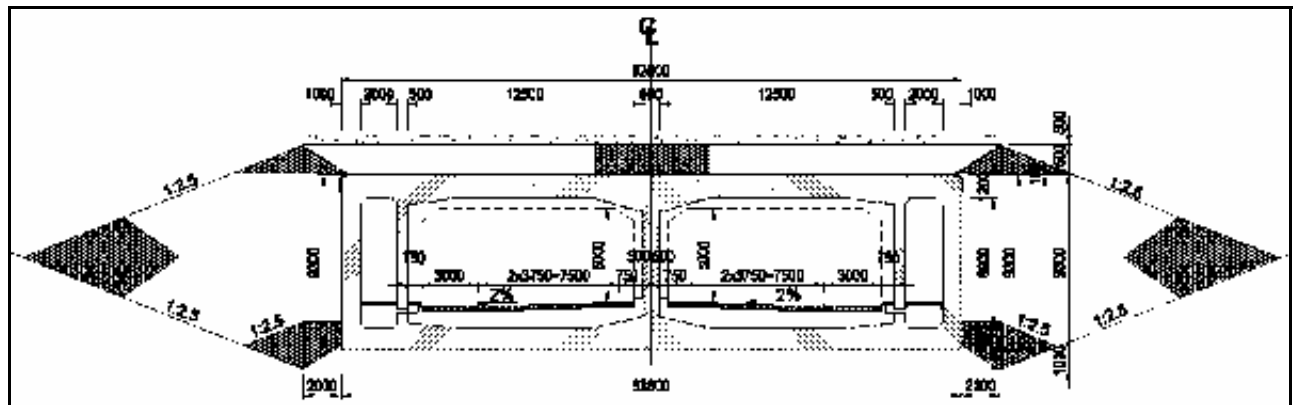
Cross-Section of 4-Lane Immersed Tube Tunnel
